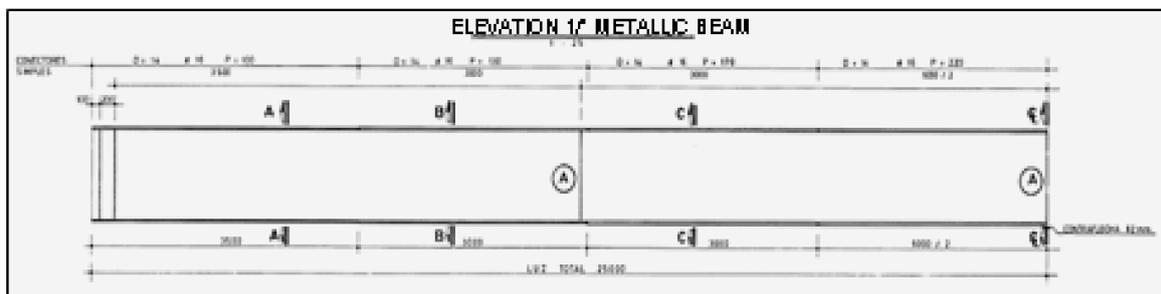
Original blueprint—steel girder in Chañar Blanco bridge.
